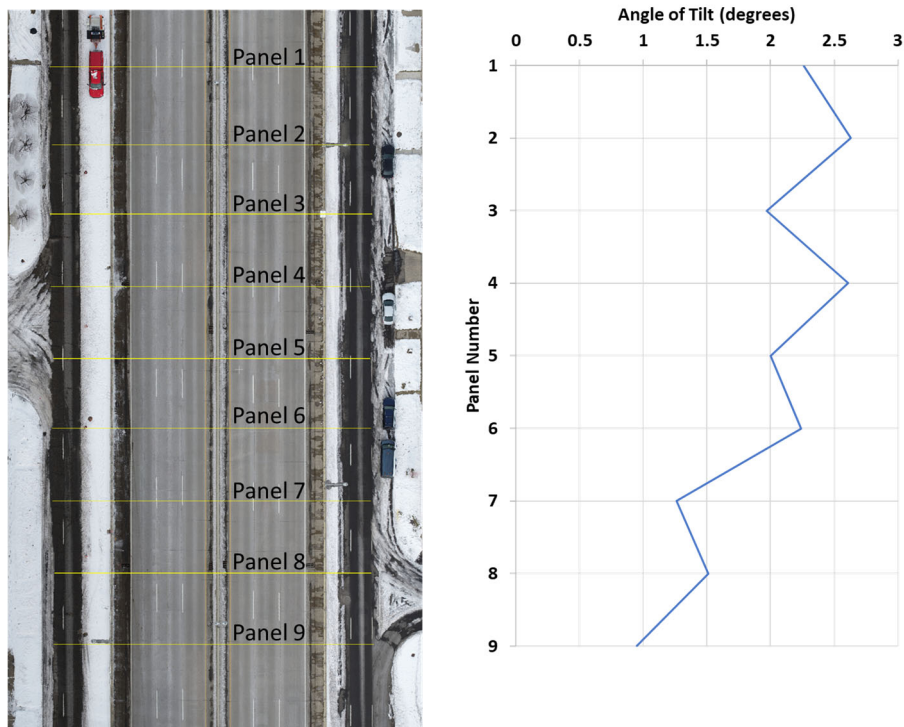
(Left) plan view of 3D point cloud model with nine panels of the M-10 retaining wall system identified; (right) measured angle of tilt of the wall at each panel.
